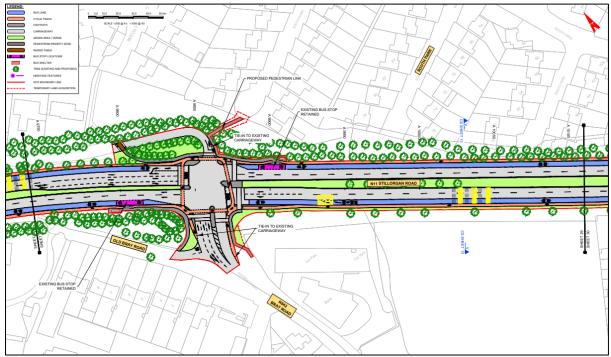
Extract from General Arrangement Drawings at South Park (Sheet 29)
